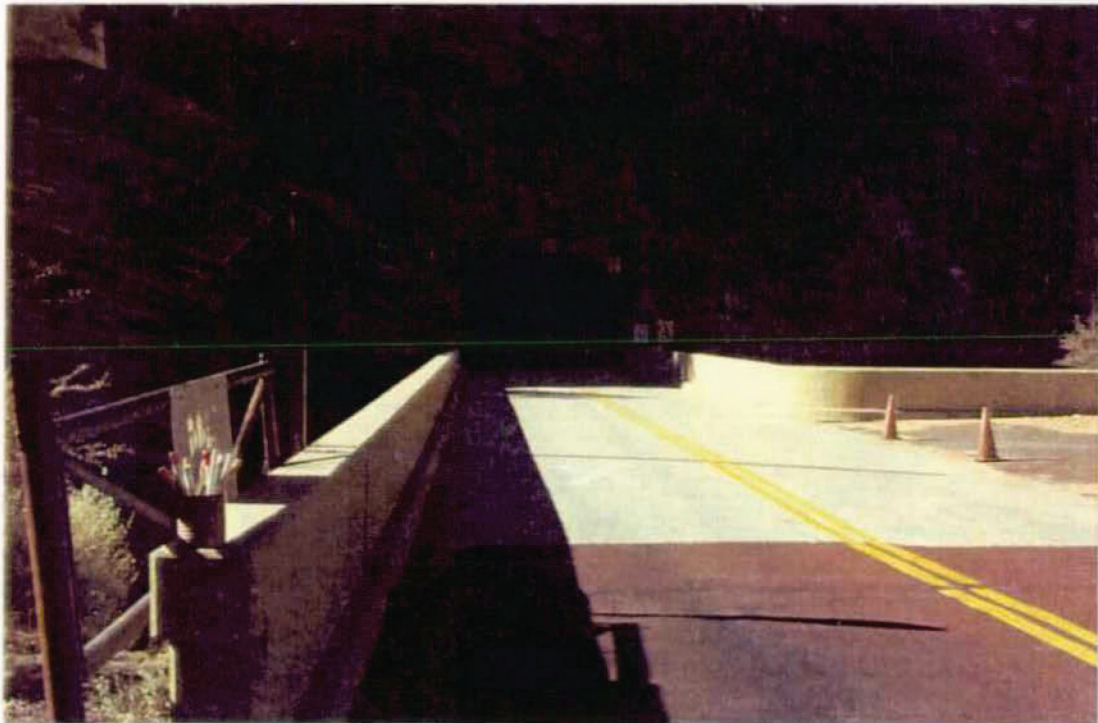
MP 6.10 East Tunnel entrance, looking back.
